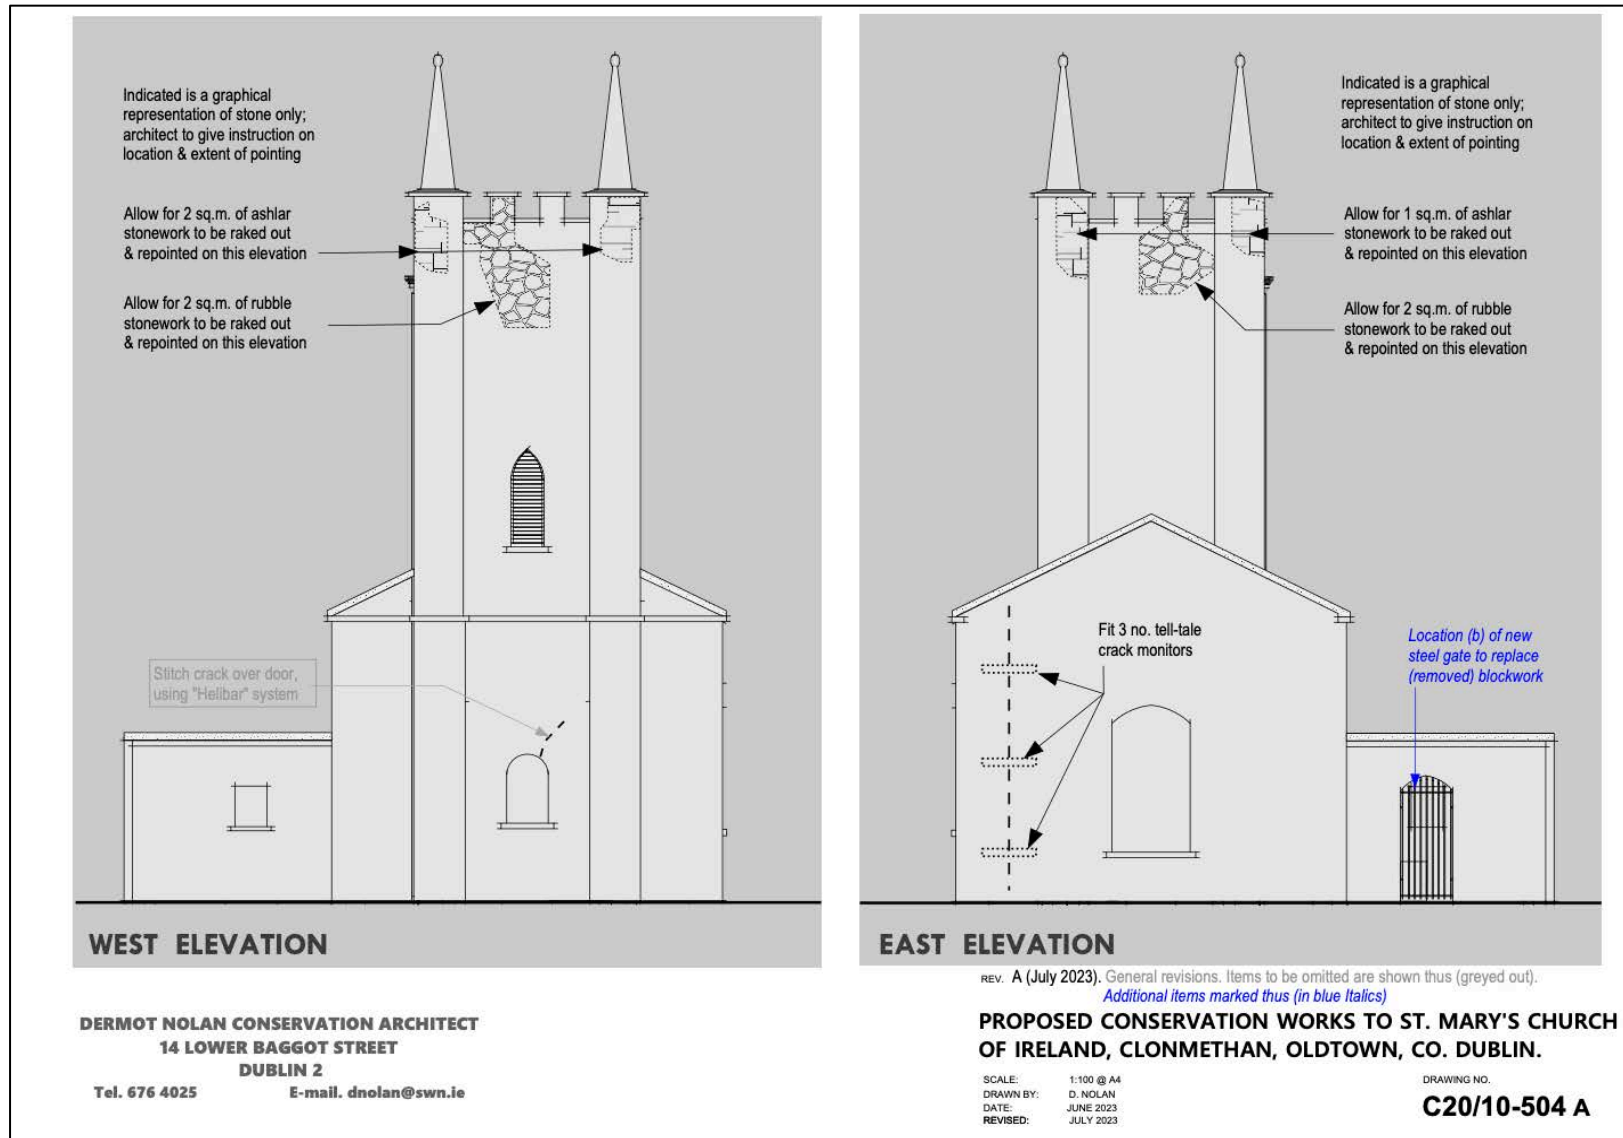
East and west elevations with details of conservation interventions (Nolan 2023a).
